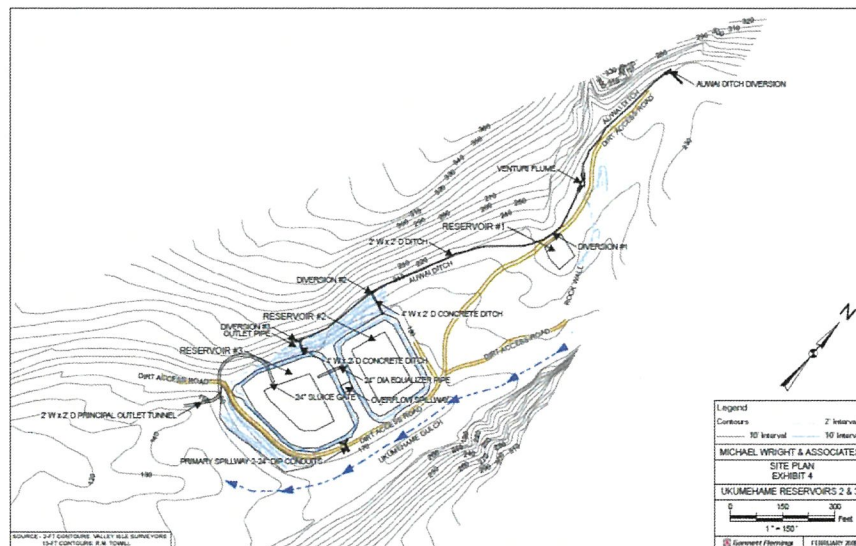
Plot plan. Source: Gannett Fleming Condition Assessment Report, April 2009.
